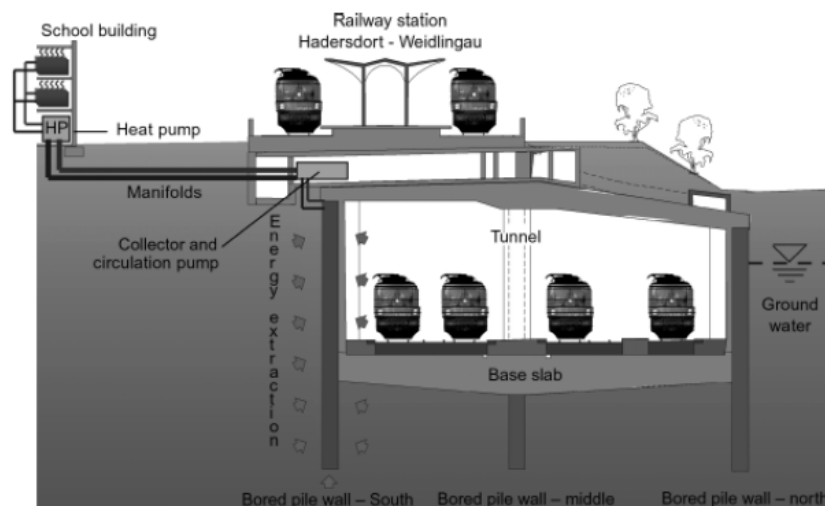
Cross Section of LT24: Hadersdorf-Weidlingau, Lainzer Tunnel
